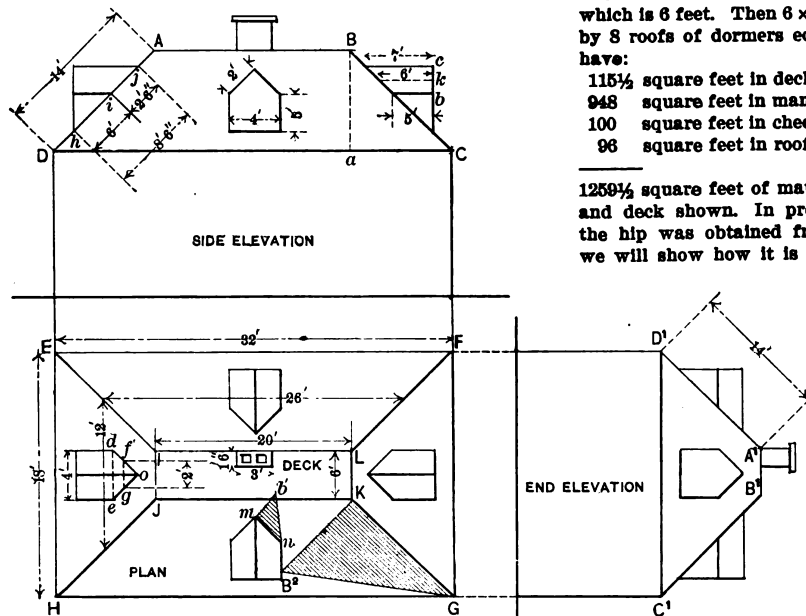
Plan and Elevations of Mansard Roof with Deck and Dormers.
